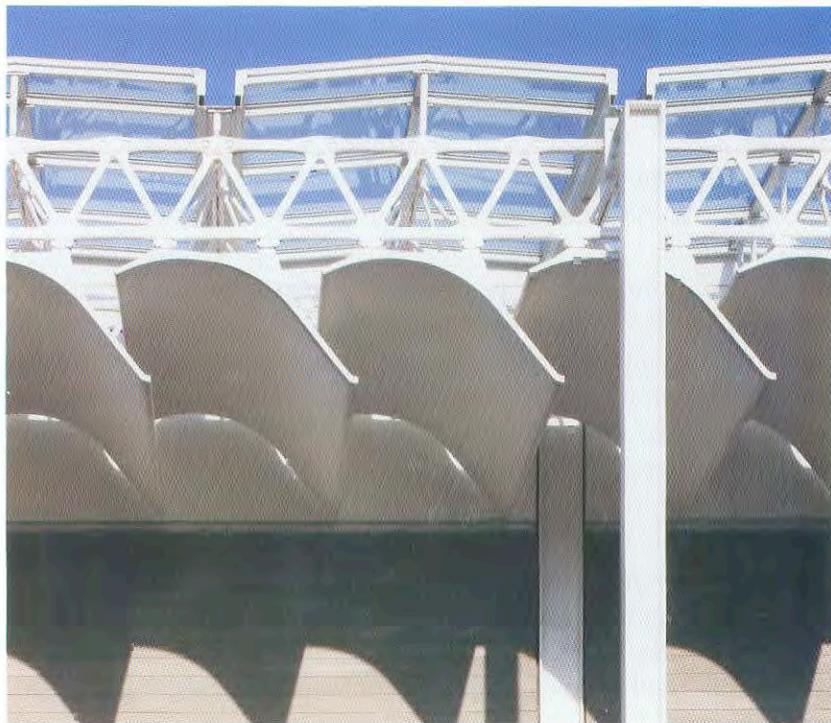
Ferro cement roof structures, working in combination with tubular steel lattices, act as daylight reflectors to a Houston art gallery. (Courtesy of Ove Arup, UK)
